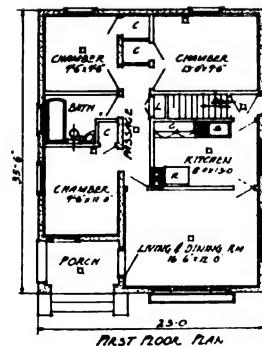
SIX BUNGALOWS FROM A SINGLE PLAN
